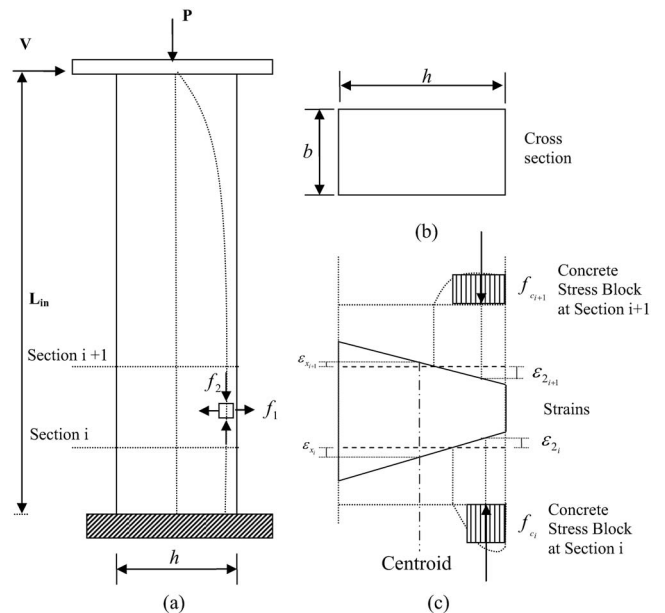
Reinforced concrete column subjected to shear and axial loads; (a) concrete principal compression stress pattern; (b) cross section; and (c) stress blocks and strains at two subsequent sections
